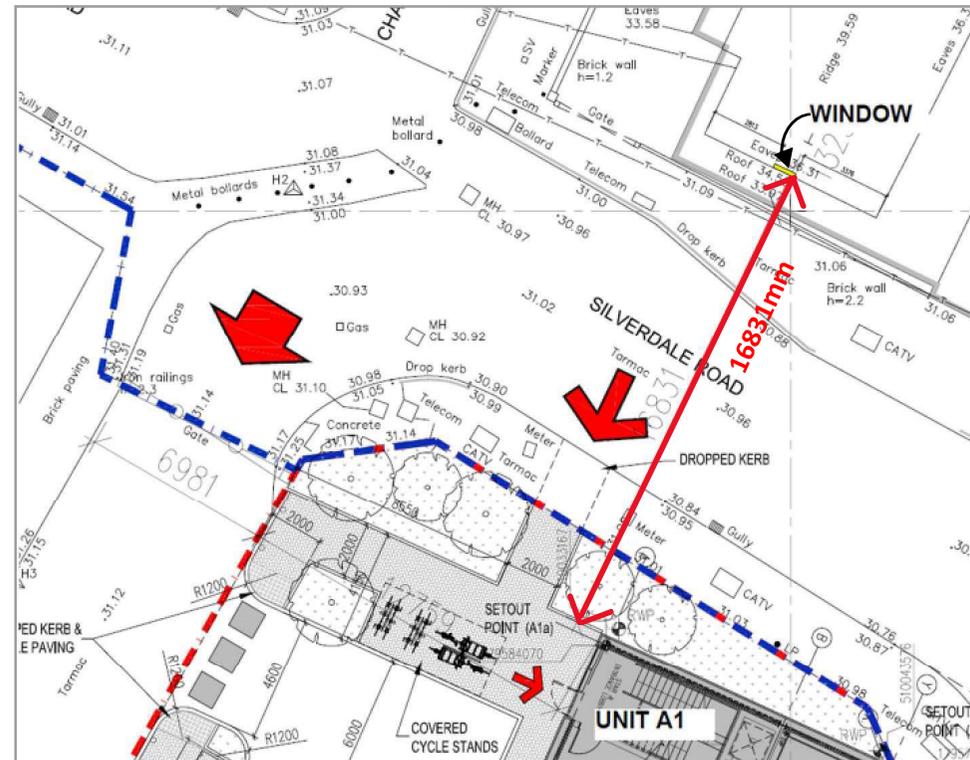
Proximity of 1 Chalfont Road (extract from Drg. No. 122016 P1002 P03)
